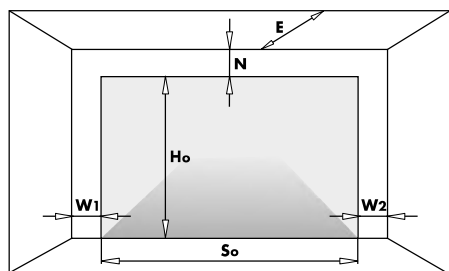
The assembly dimensions and designations thereof required for correct selection and assembly of the BR-100 industrial roller door.
